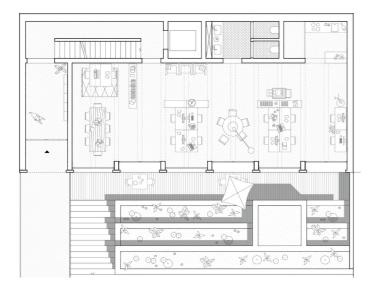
JWA Berlin + Ralf Wilkening Architect, Remise
